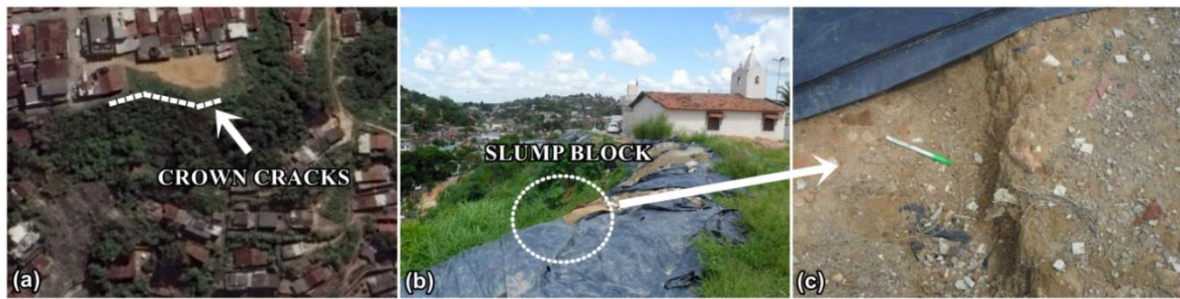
Location of the (a) cracks and (b, c) slump block - Adapted from Souza (2014).
